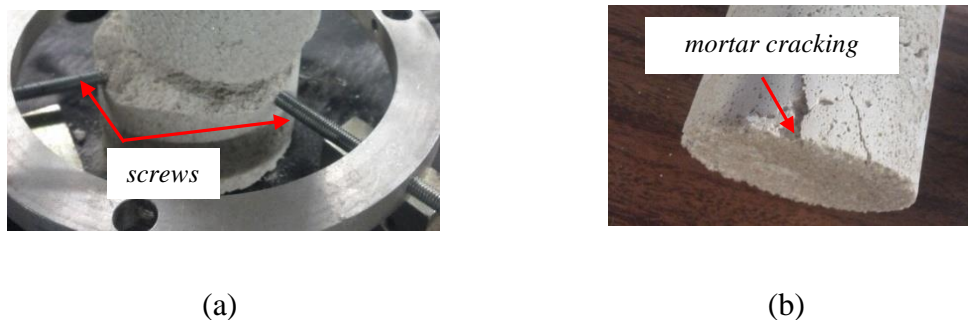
Problems during the e-modulus test (a) break due to screws - (b) cracks in the specimen
